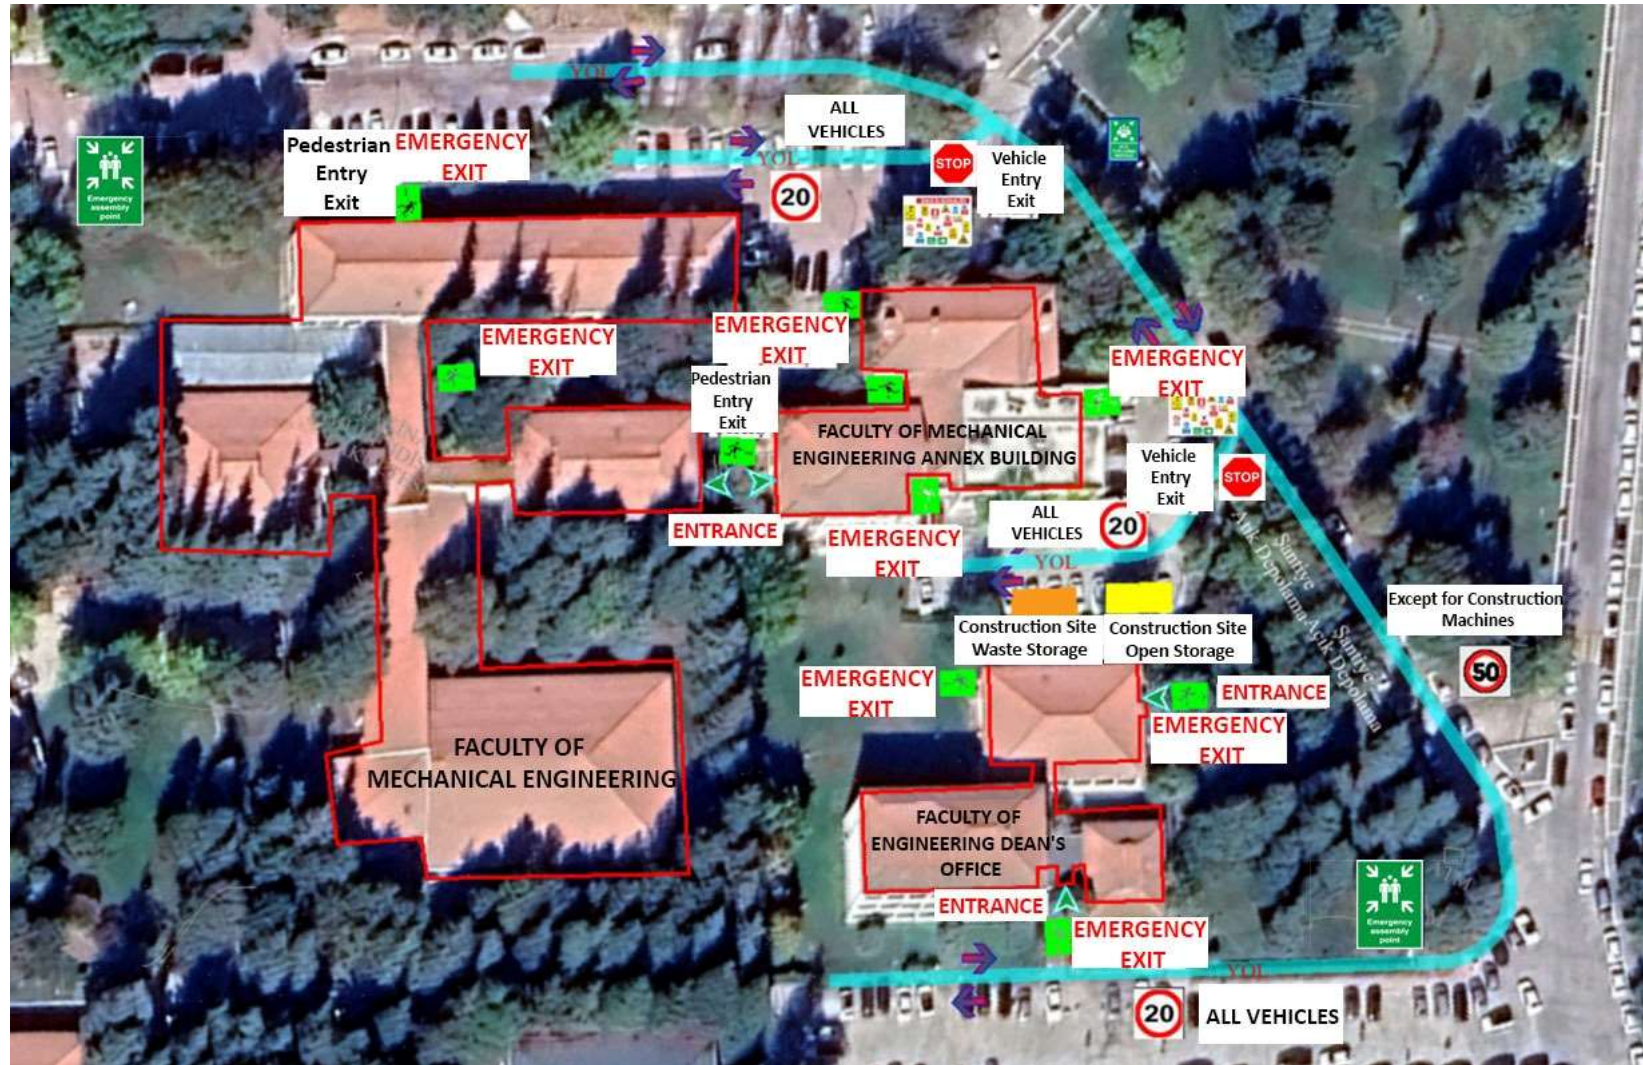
Site Traffic Plan for the Mechanical Engineering Faculty, Mechanical Engineering Faculty Annex Building, and Engineering Faculty Dean's Office
